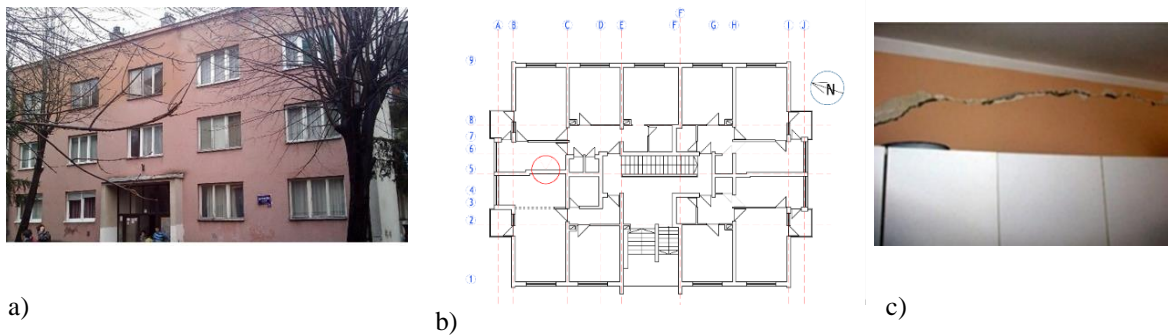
URM building located in the Njegoseva Street No.2, Kraljevo: a) west façade; b) typical floor plan, and c) severe cracking in a longitudinal wall at the 2nd floor level (gridline 5).
